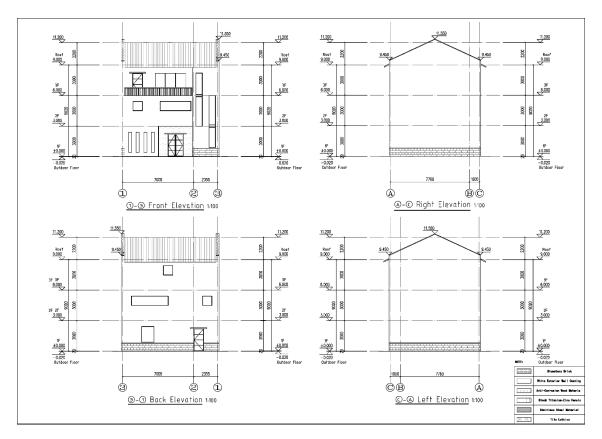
The Four Elevations of Sample Building No. 2 (Drawn by the author)
